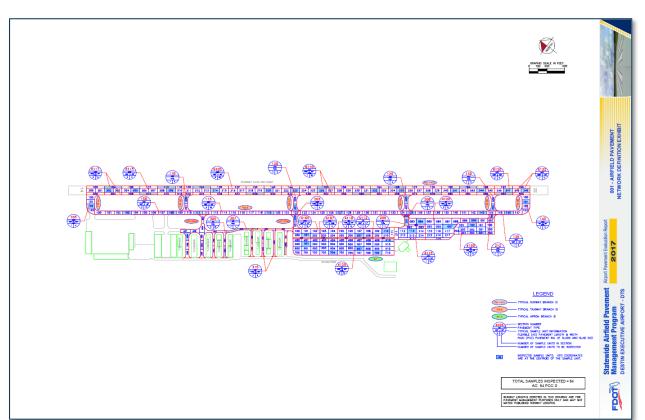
2017 Airfield Pavement Network Definition Exhibit
